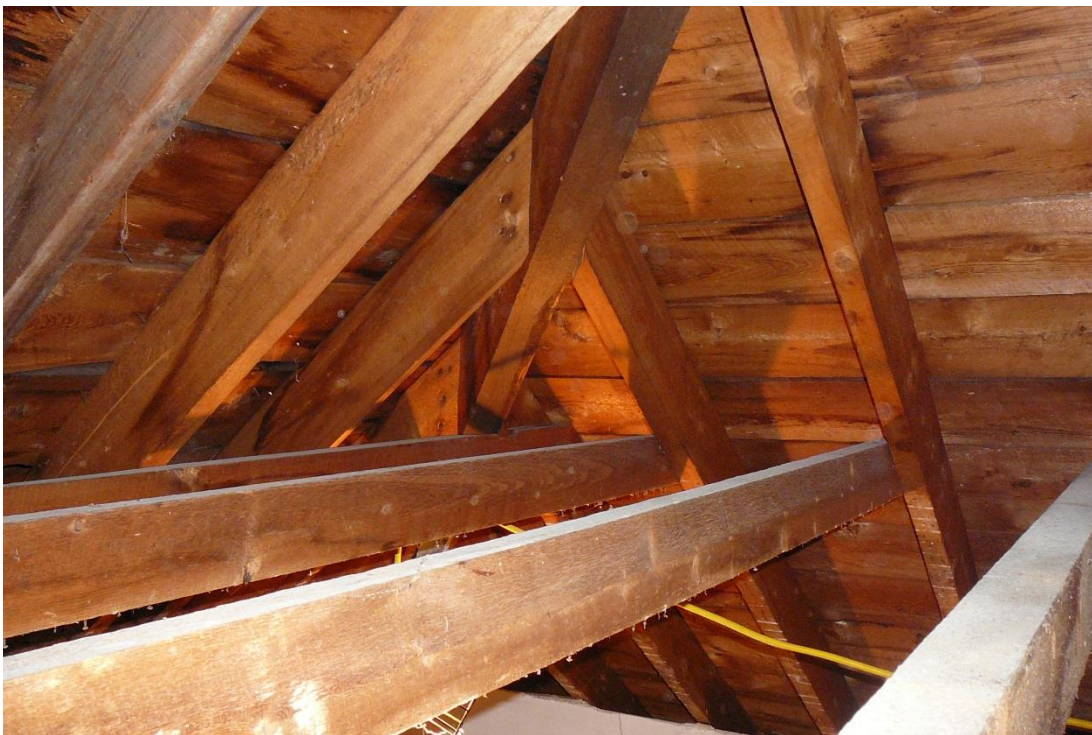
Attic floor roof structure, south room (A4), view southwest (Quinn 2017).
